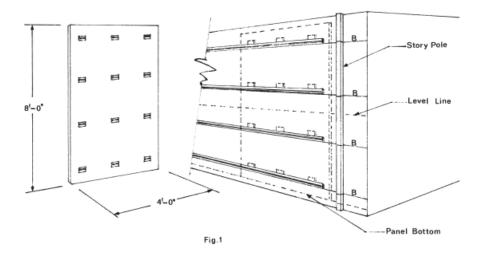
A schematic how clips work with Stonewood for interior wall installation
